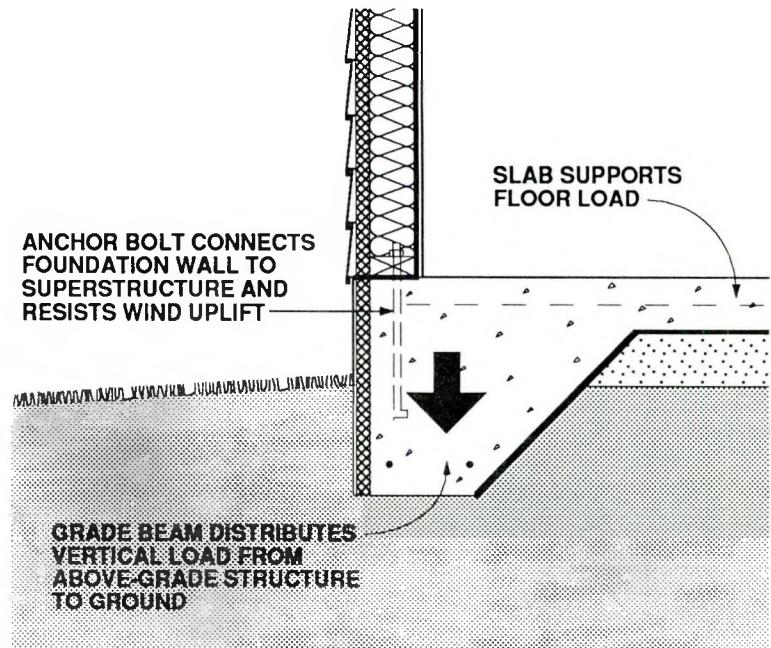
Structural Components of Slab-on-Grade Foundation with Grade Beam
